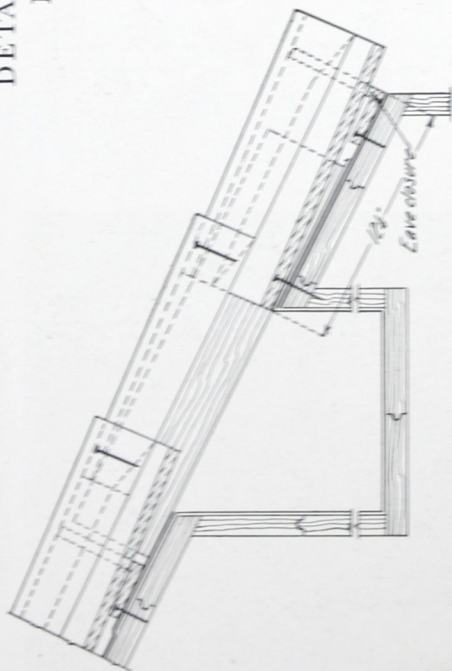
# DETAILS OF IMPERIAL SMALL TAPERED MISSION TILES AND FITTINGS
